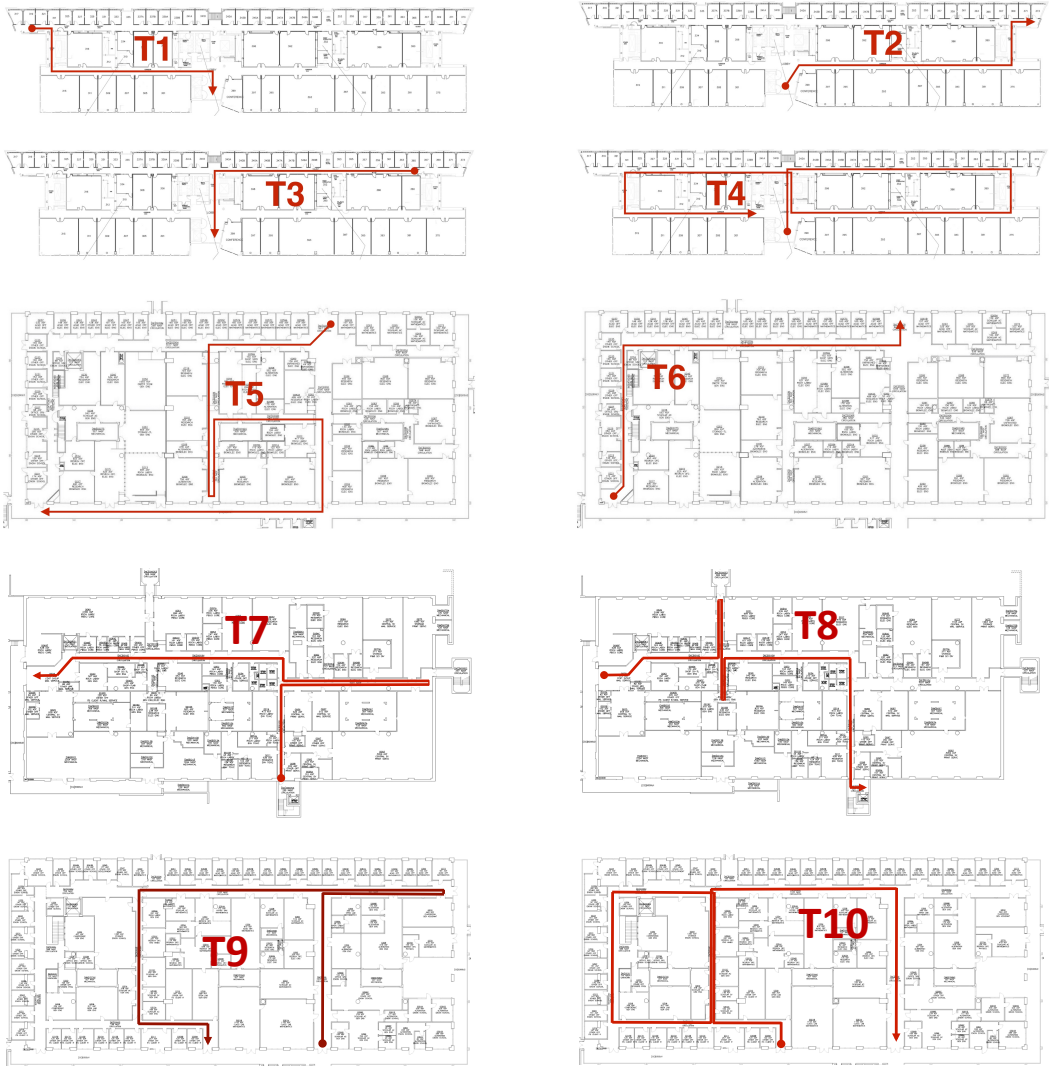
The paths traversed by our participants. T1-T4: E2 3rd floor. T5-T6: BE 2nd floor. T7-T8: BE basement. T9-T10: BE 3rd floor.
